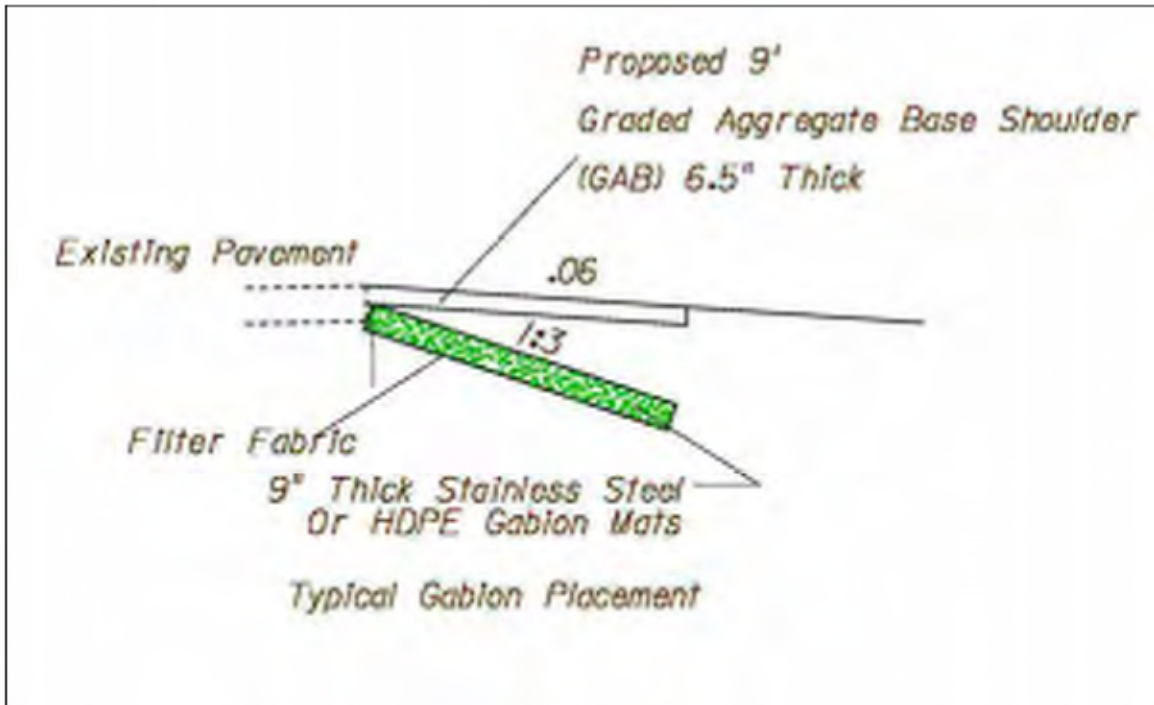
Gabions at edge of pavement to resist pavement damage due to coastal storm surge overwash. (Florida DOT figure)
